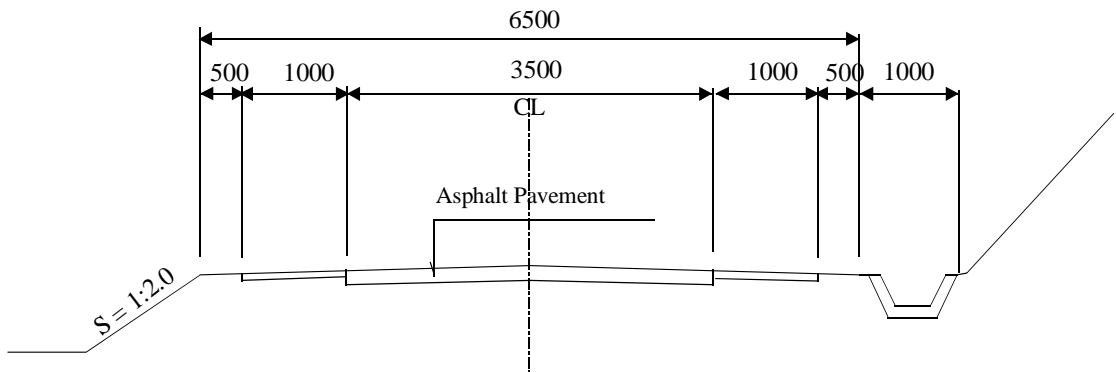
Road Classification V (NR15A) on Embankment Section
